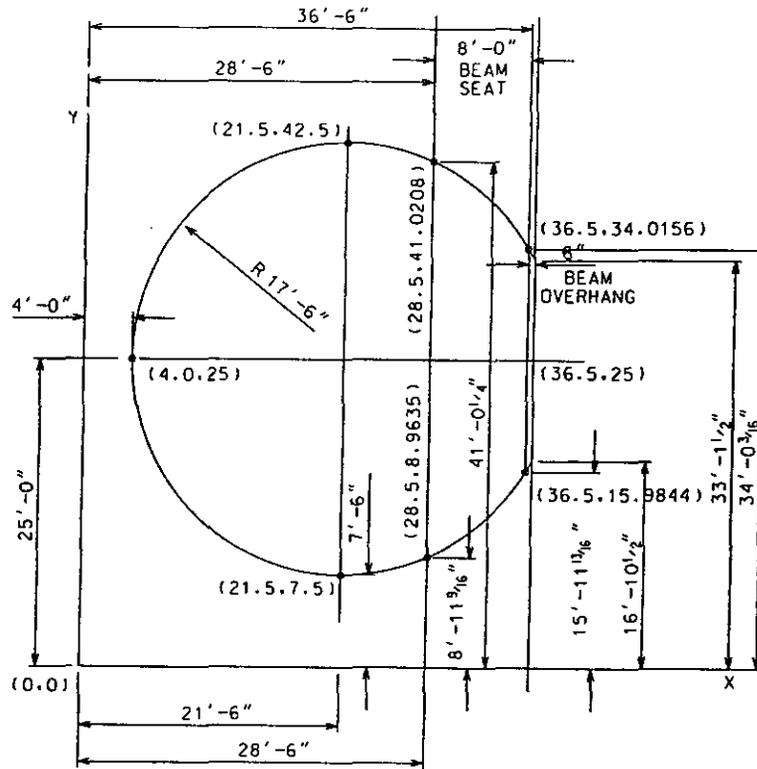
Typical Plan View of Intermediate Cells for Lock No. 22
